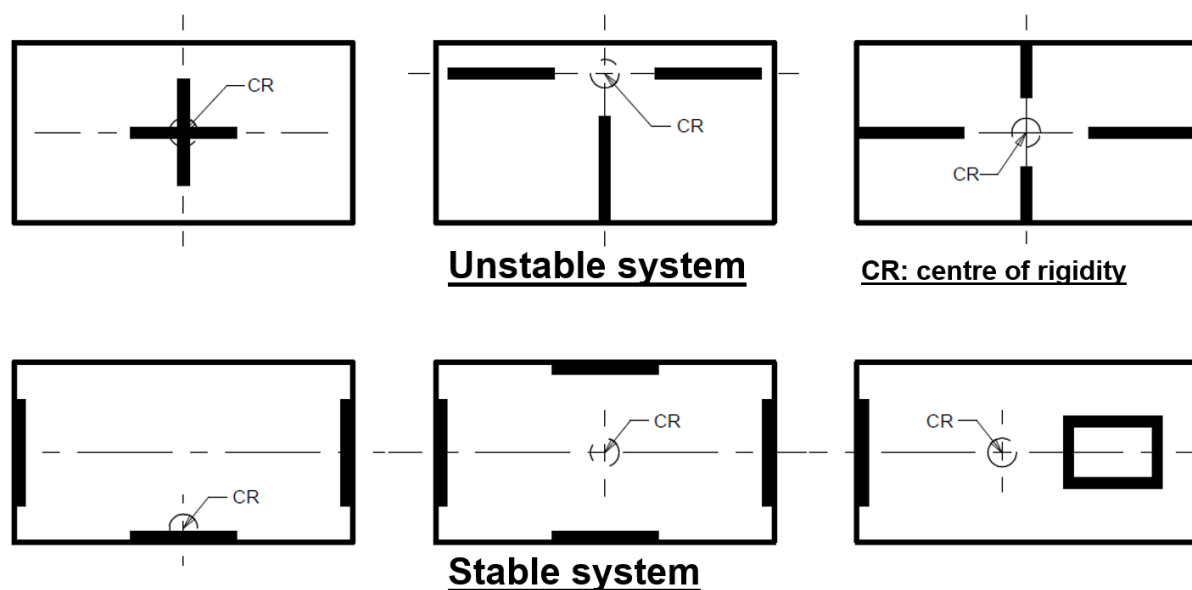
Stable vs unstable wall arrangement (adapted from Fig 5.2 Pauley & Priestley (1992))
